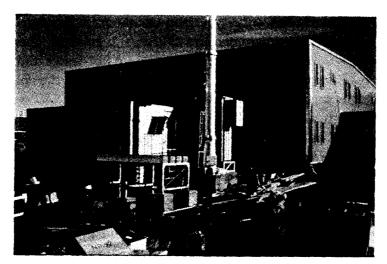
A cold storage room and a heat-pipe type gas-to-air heat exchanger built on the side of the new engine room.
